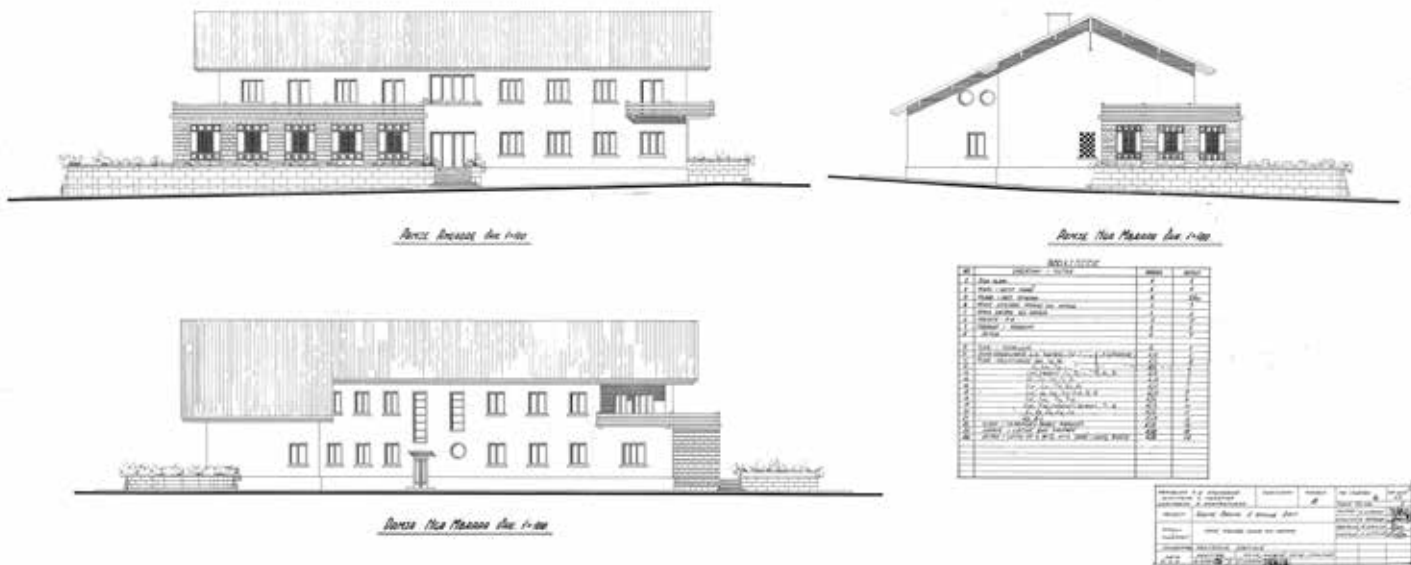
Skënder Luarasi, Villa in Dajt, 1961, construction documents, façades (TCAC)
